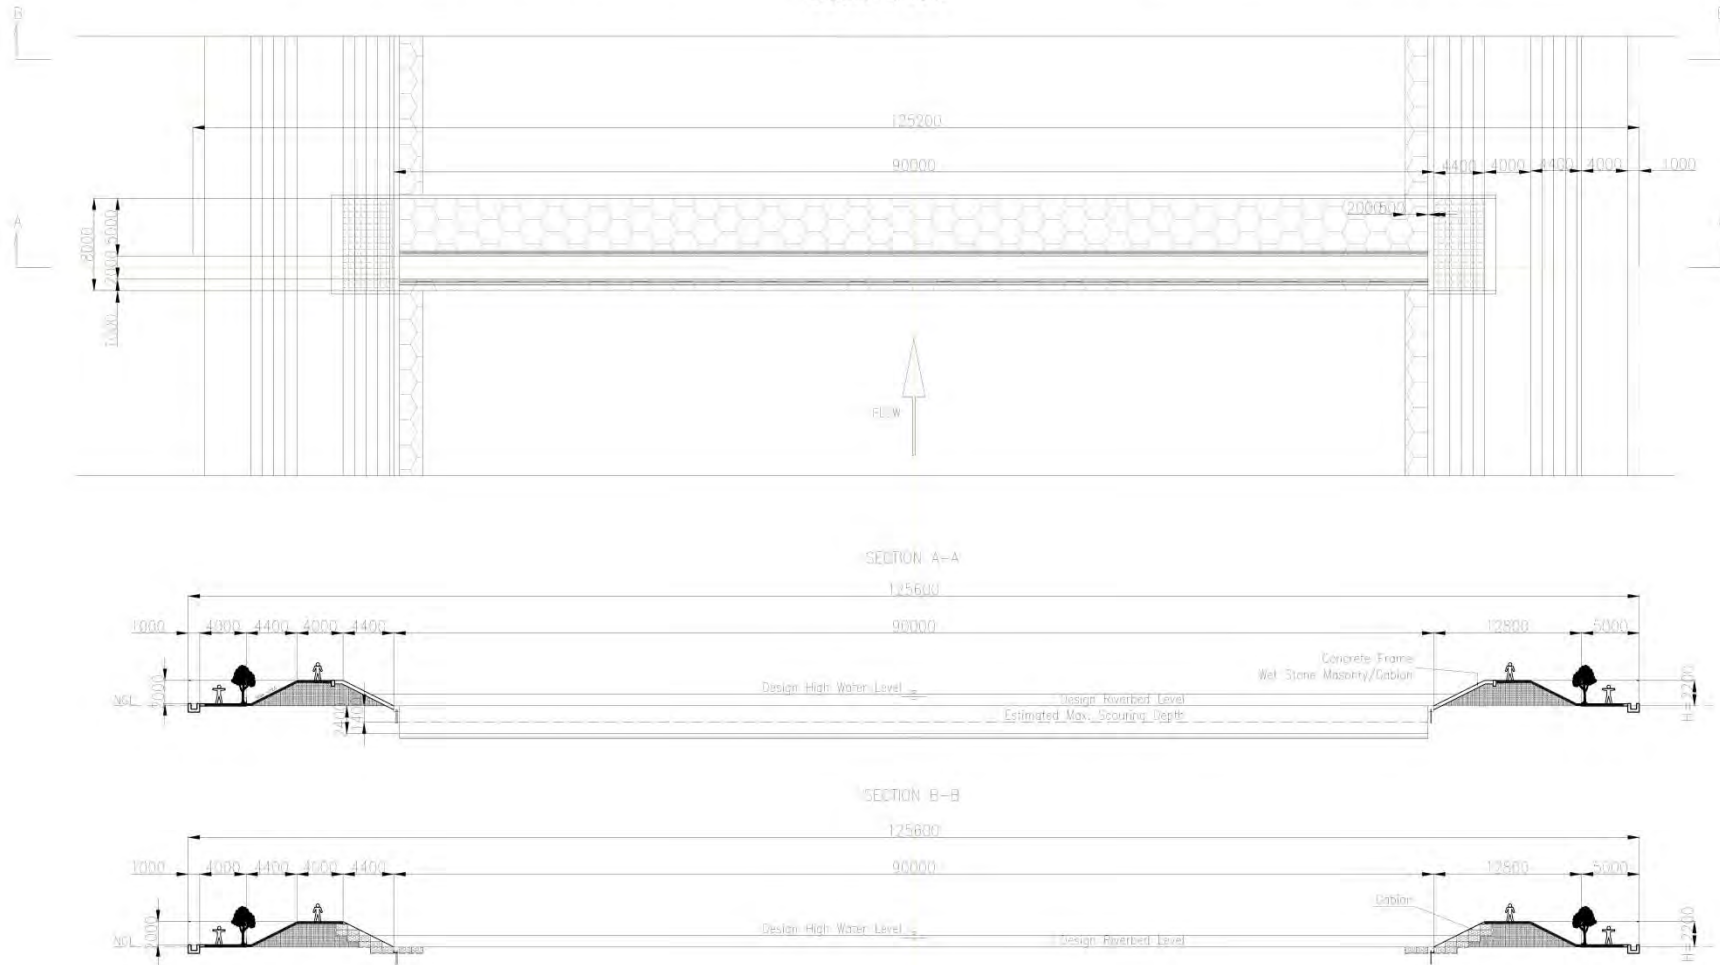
Plan and Typical Section of Groundsill and Typical Section of River Channel in Maswala River Training Works
